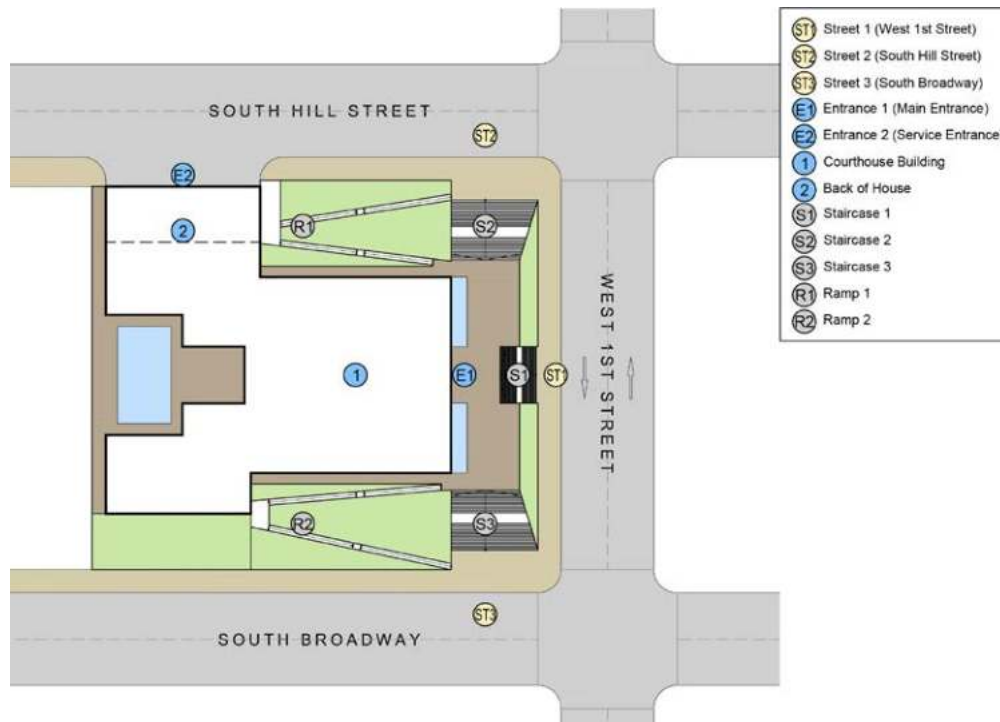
Site Plan of U.S. Courthouse, Los Angeles
